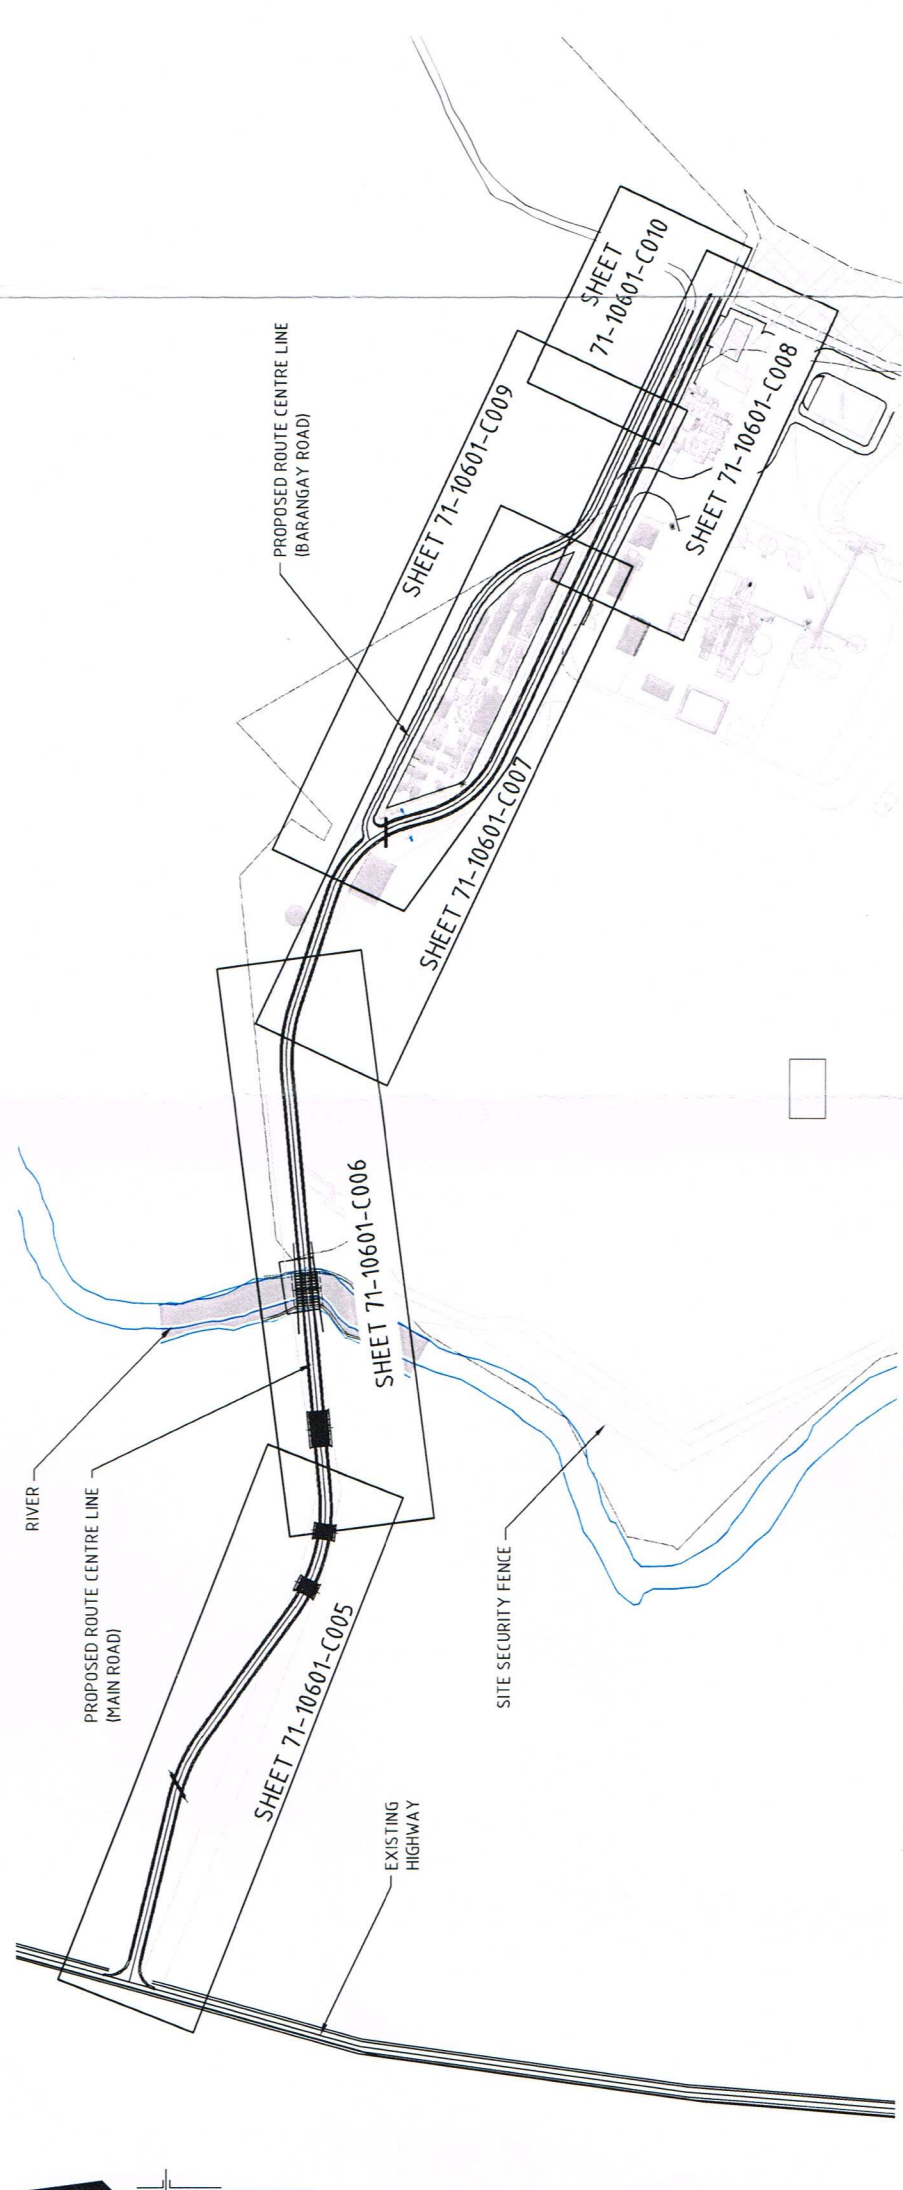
is the layout of the access road. Reinforced concrete pipe culverts will be used for the waterway crossings including the vents of the Irish Crossing across Magpayang River. Side ditches are also provided along road sections near the proposed offices and living quarters. Figure 3-16 is the design of the Irish Crossing.
